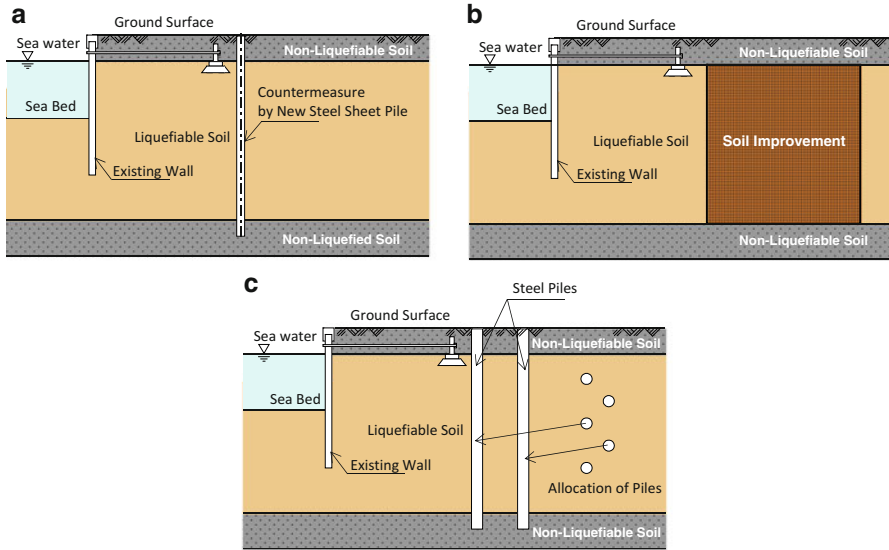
Countermeasures of existing quay walls against flow of liquefiable soil. (a) Steel sheet pile. (b) Soil improvement. (c) Steel piling
